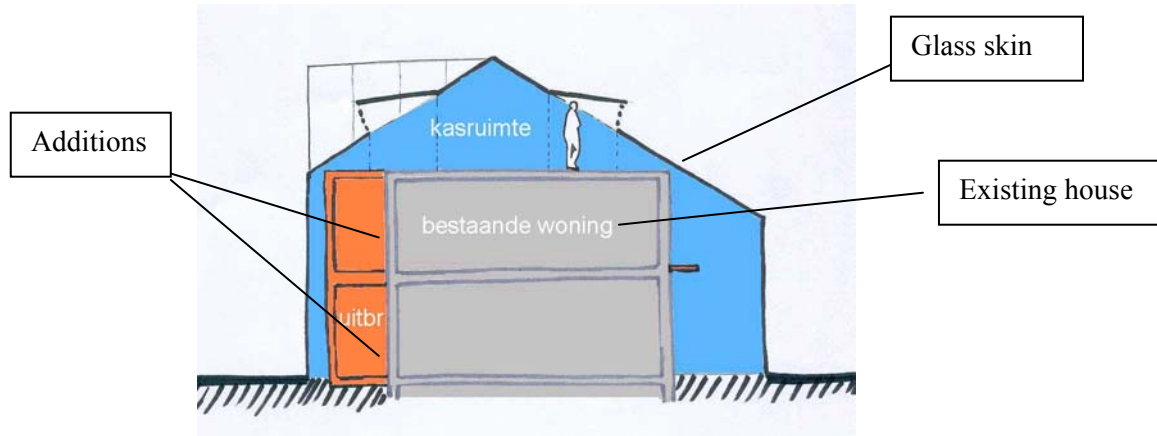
The existing structure, the glass skin and the addition in vertical section.
